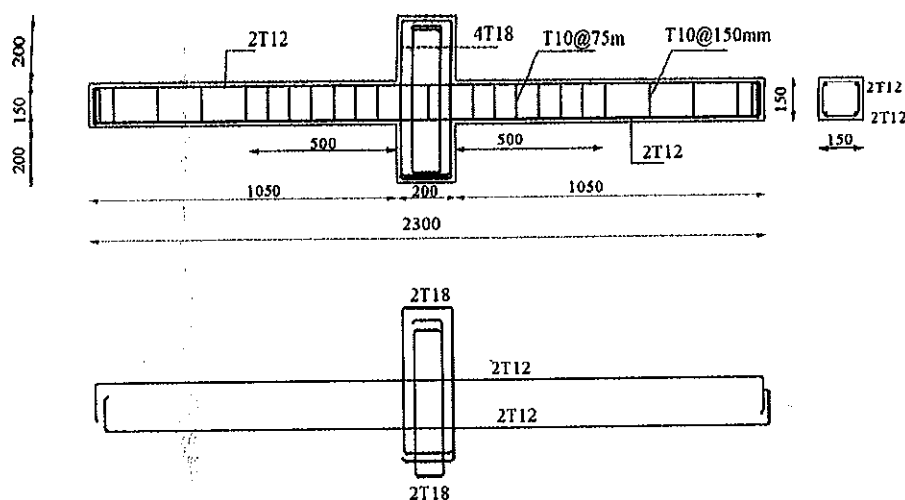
Concrete dimensions and steel reinforcement details of specimen C1.
